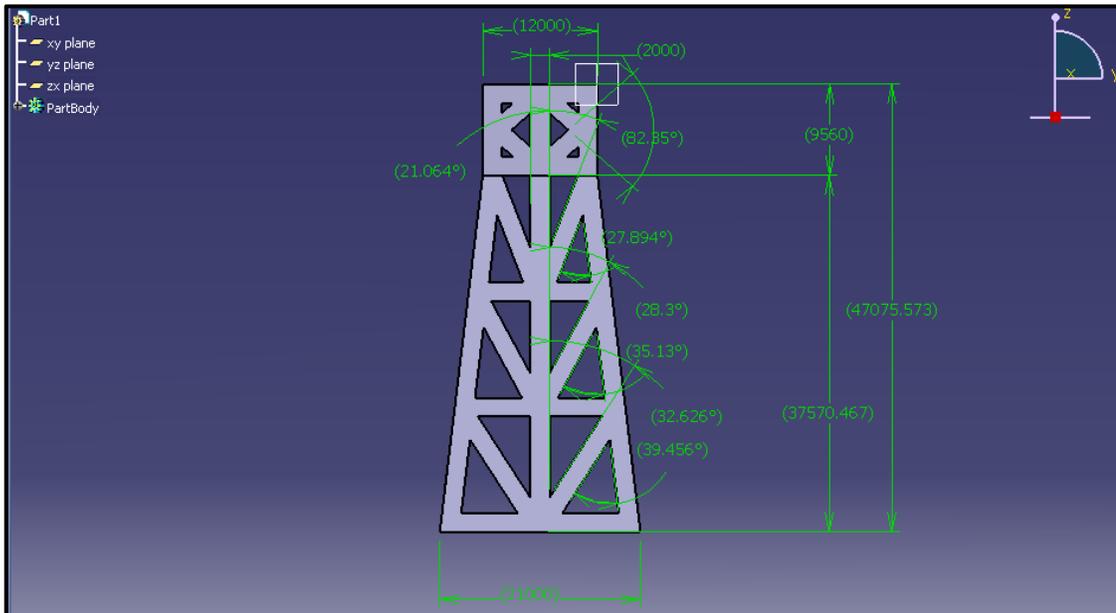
Jacket Structure drawing with 2 m x 2 m cross-sectional area of steel members with dimensions.
